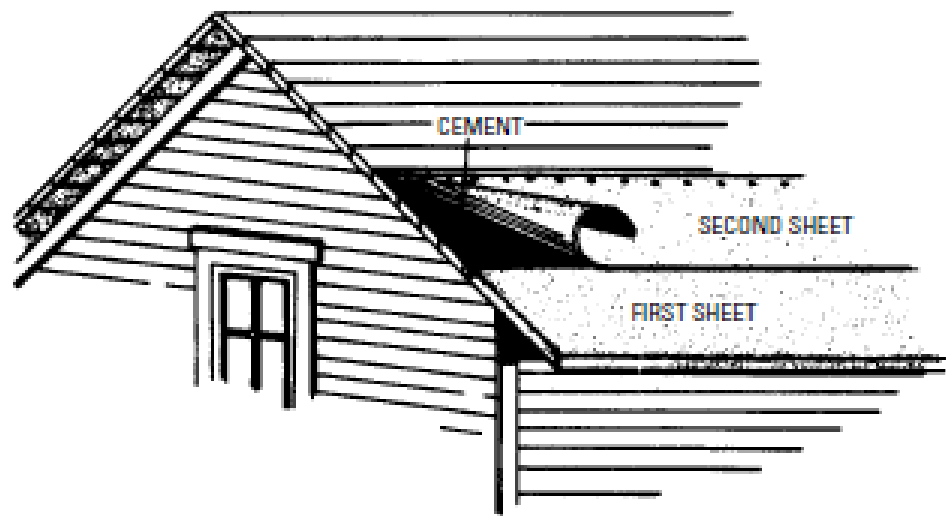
Method of cementing and lapping the first and second strips of roll roofing.
